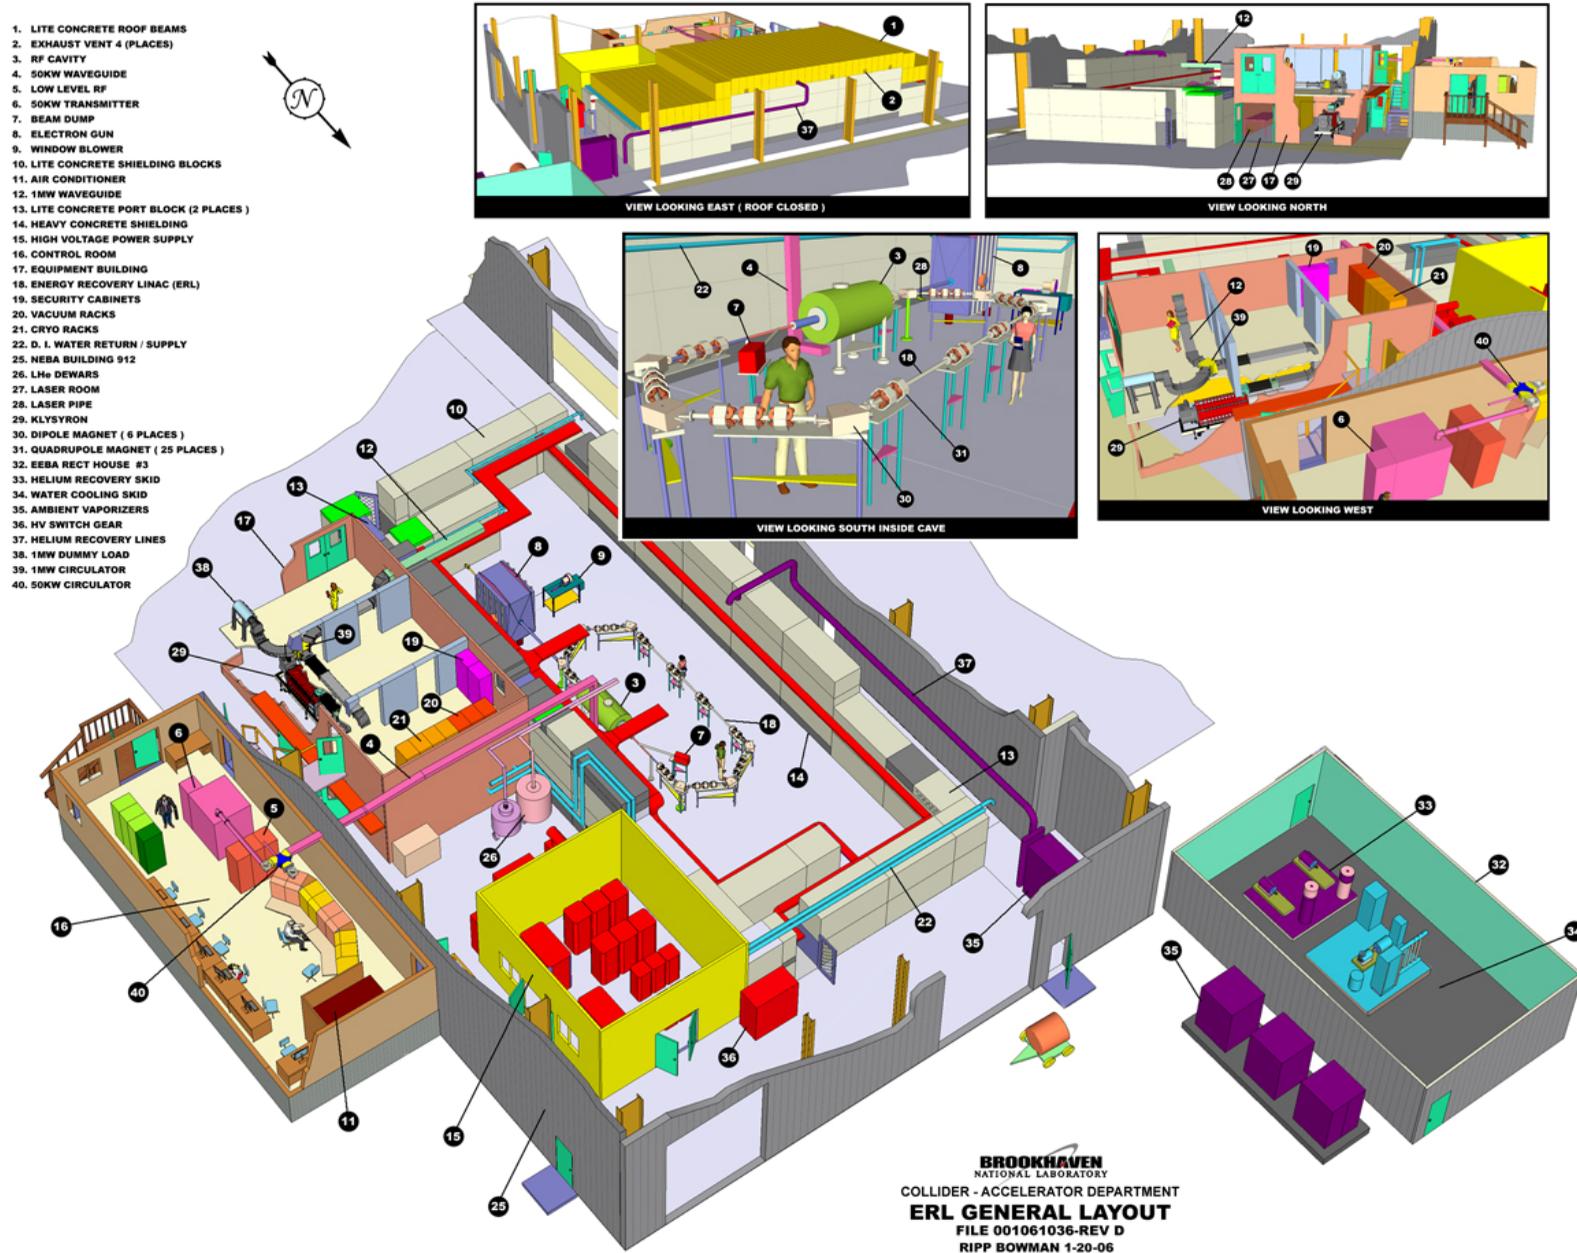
c Drawing of Prototype ERL Enclosure and Ring
